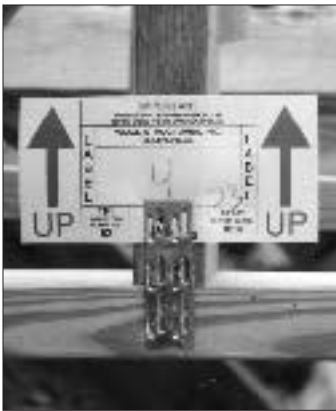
In order to work properly, a floor truss must be installed right-side-up, as labeled. An upside-down truss is a recipe for failure.
